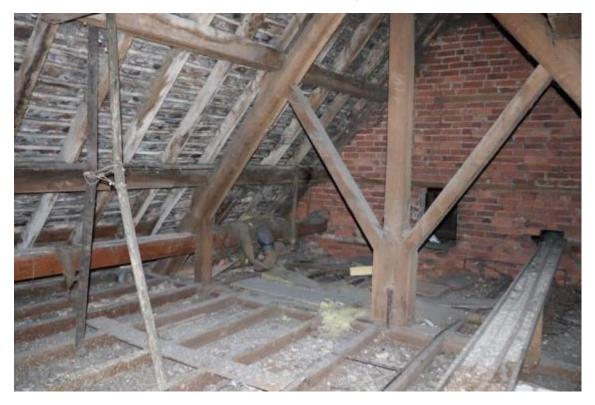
Phase 3 roof truss visible above room S10, looking south-east, no scale
